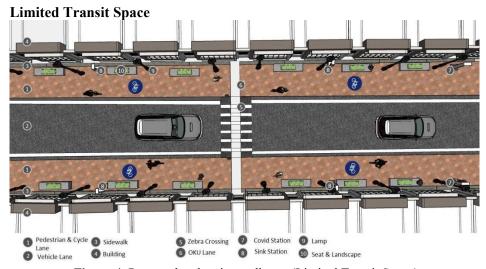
Proposed pedestrian walkway (Limited Transit Space)
